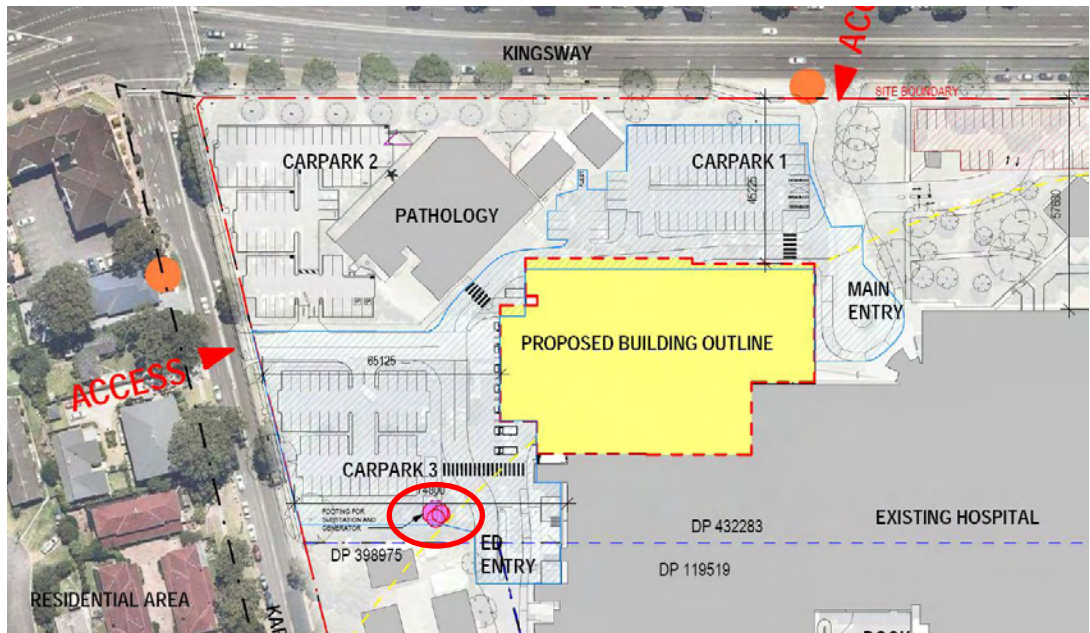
Proposed Site Plan showing location of three (3) trees to be removed - circled in red (Source: BVN)
